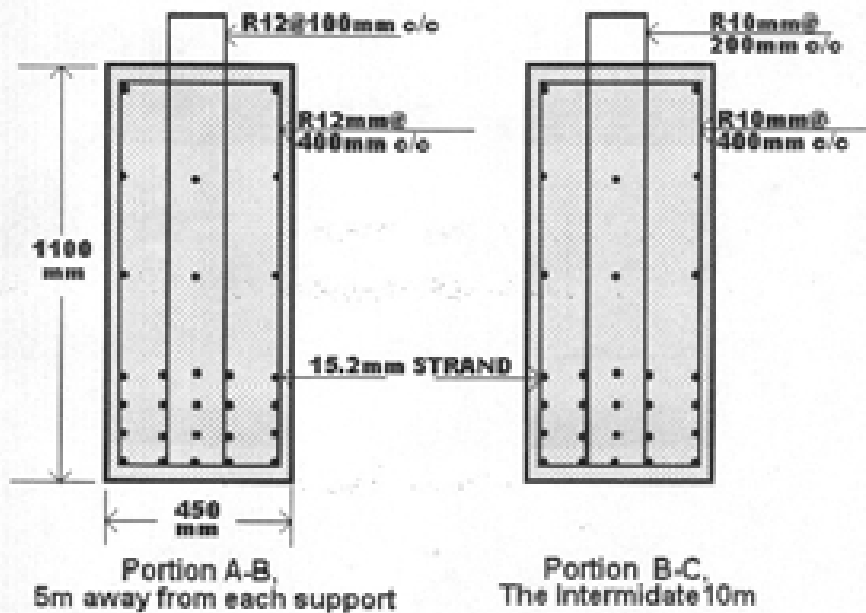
Pre-stressed Beam c/s Reinforcement Details
